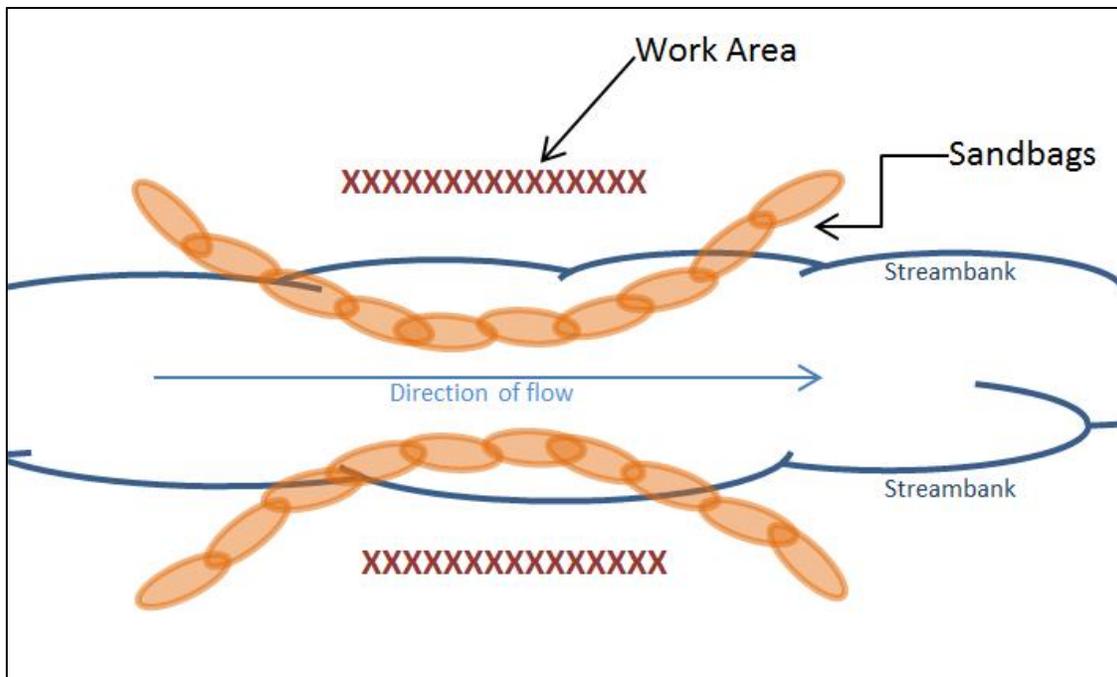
A diagram of sandbag cofferdams used to create work areas around bridge abutments.
